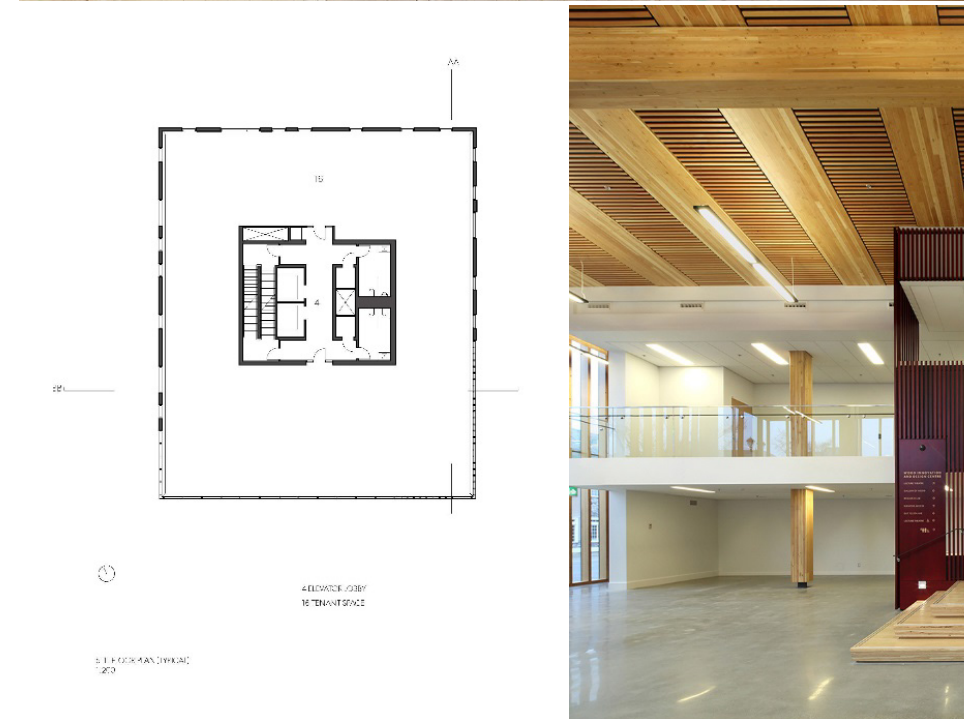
Typical Floor Plan (Lower Left) (from Michael Green Architecture)
